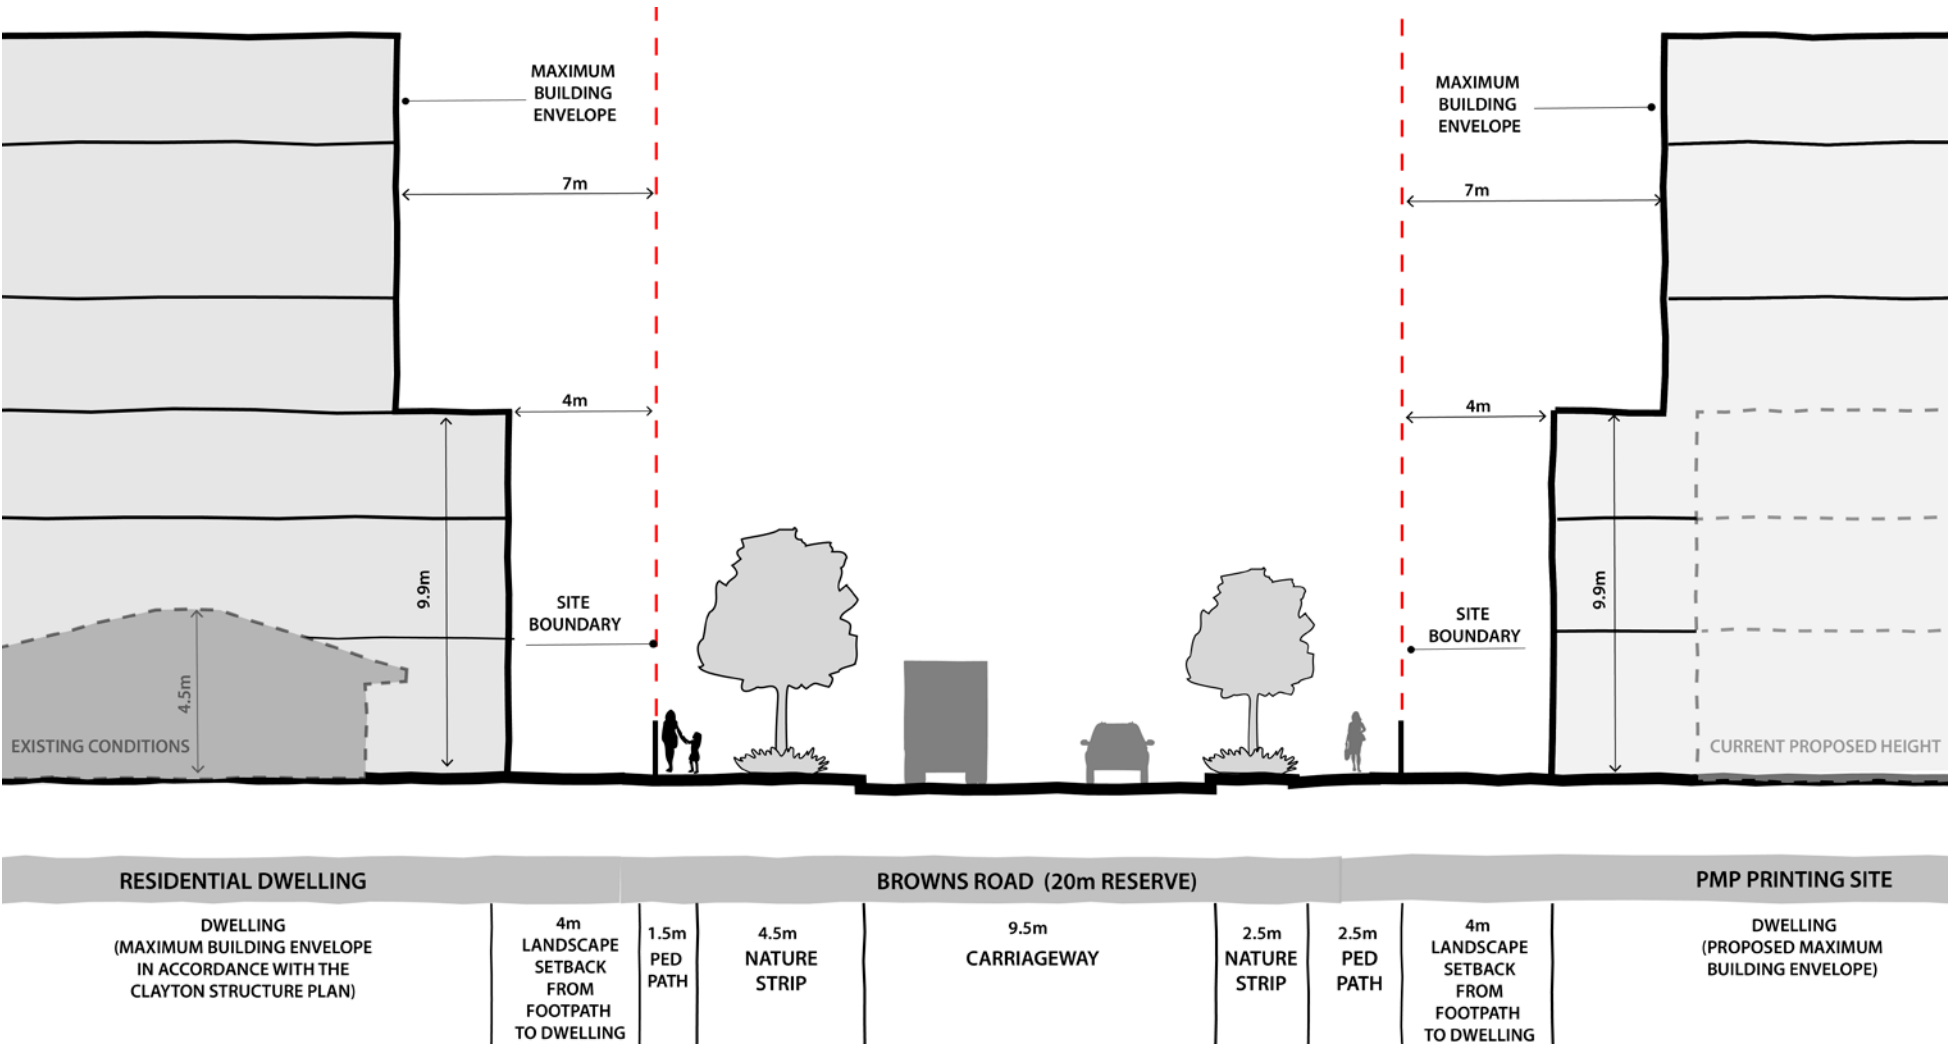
Proposed Typical Section Showing Potential Development Envelopes along the Browns Road Interface (note - building floors are indicative only and will be subject to change according to the building typology)
